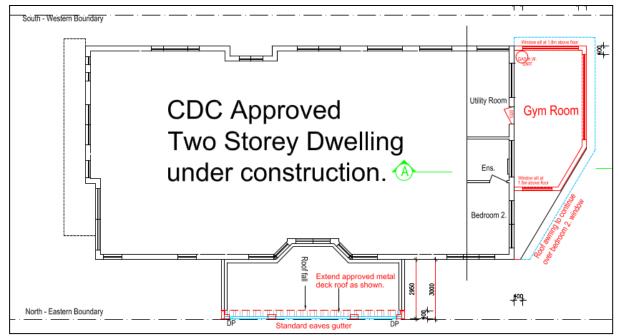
First floor plan with proposed alterations and additions highlighted in red.
